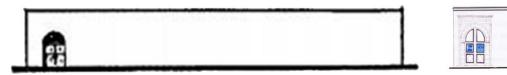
Local Houses Facade, (Elwerfalli, 2016)
